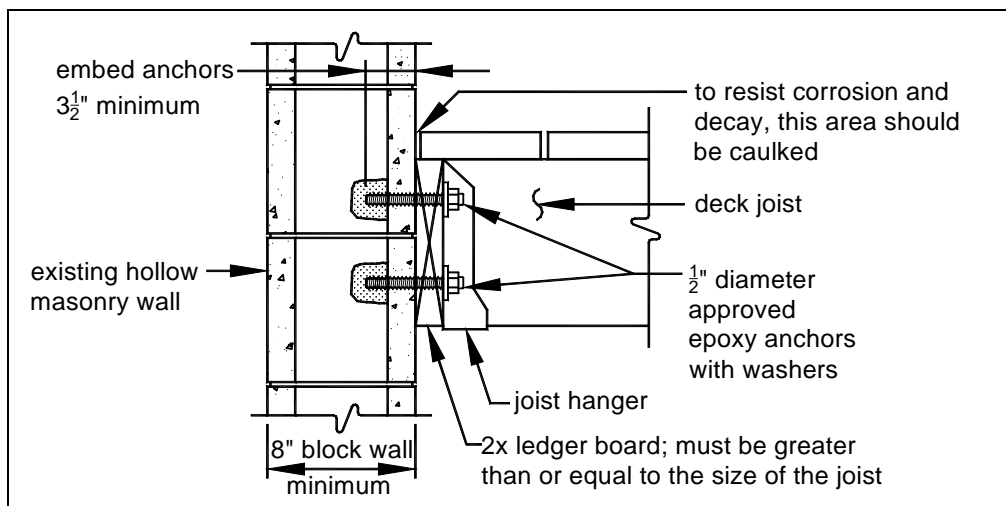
ATTACHMENT OF LEDGER BOARD-TO-FOUNDATION WALL (HOLLOW MASONRY)
